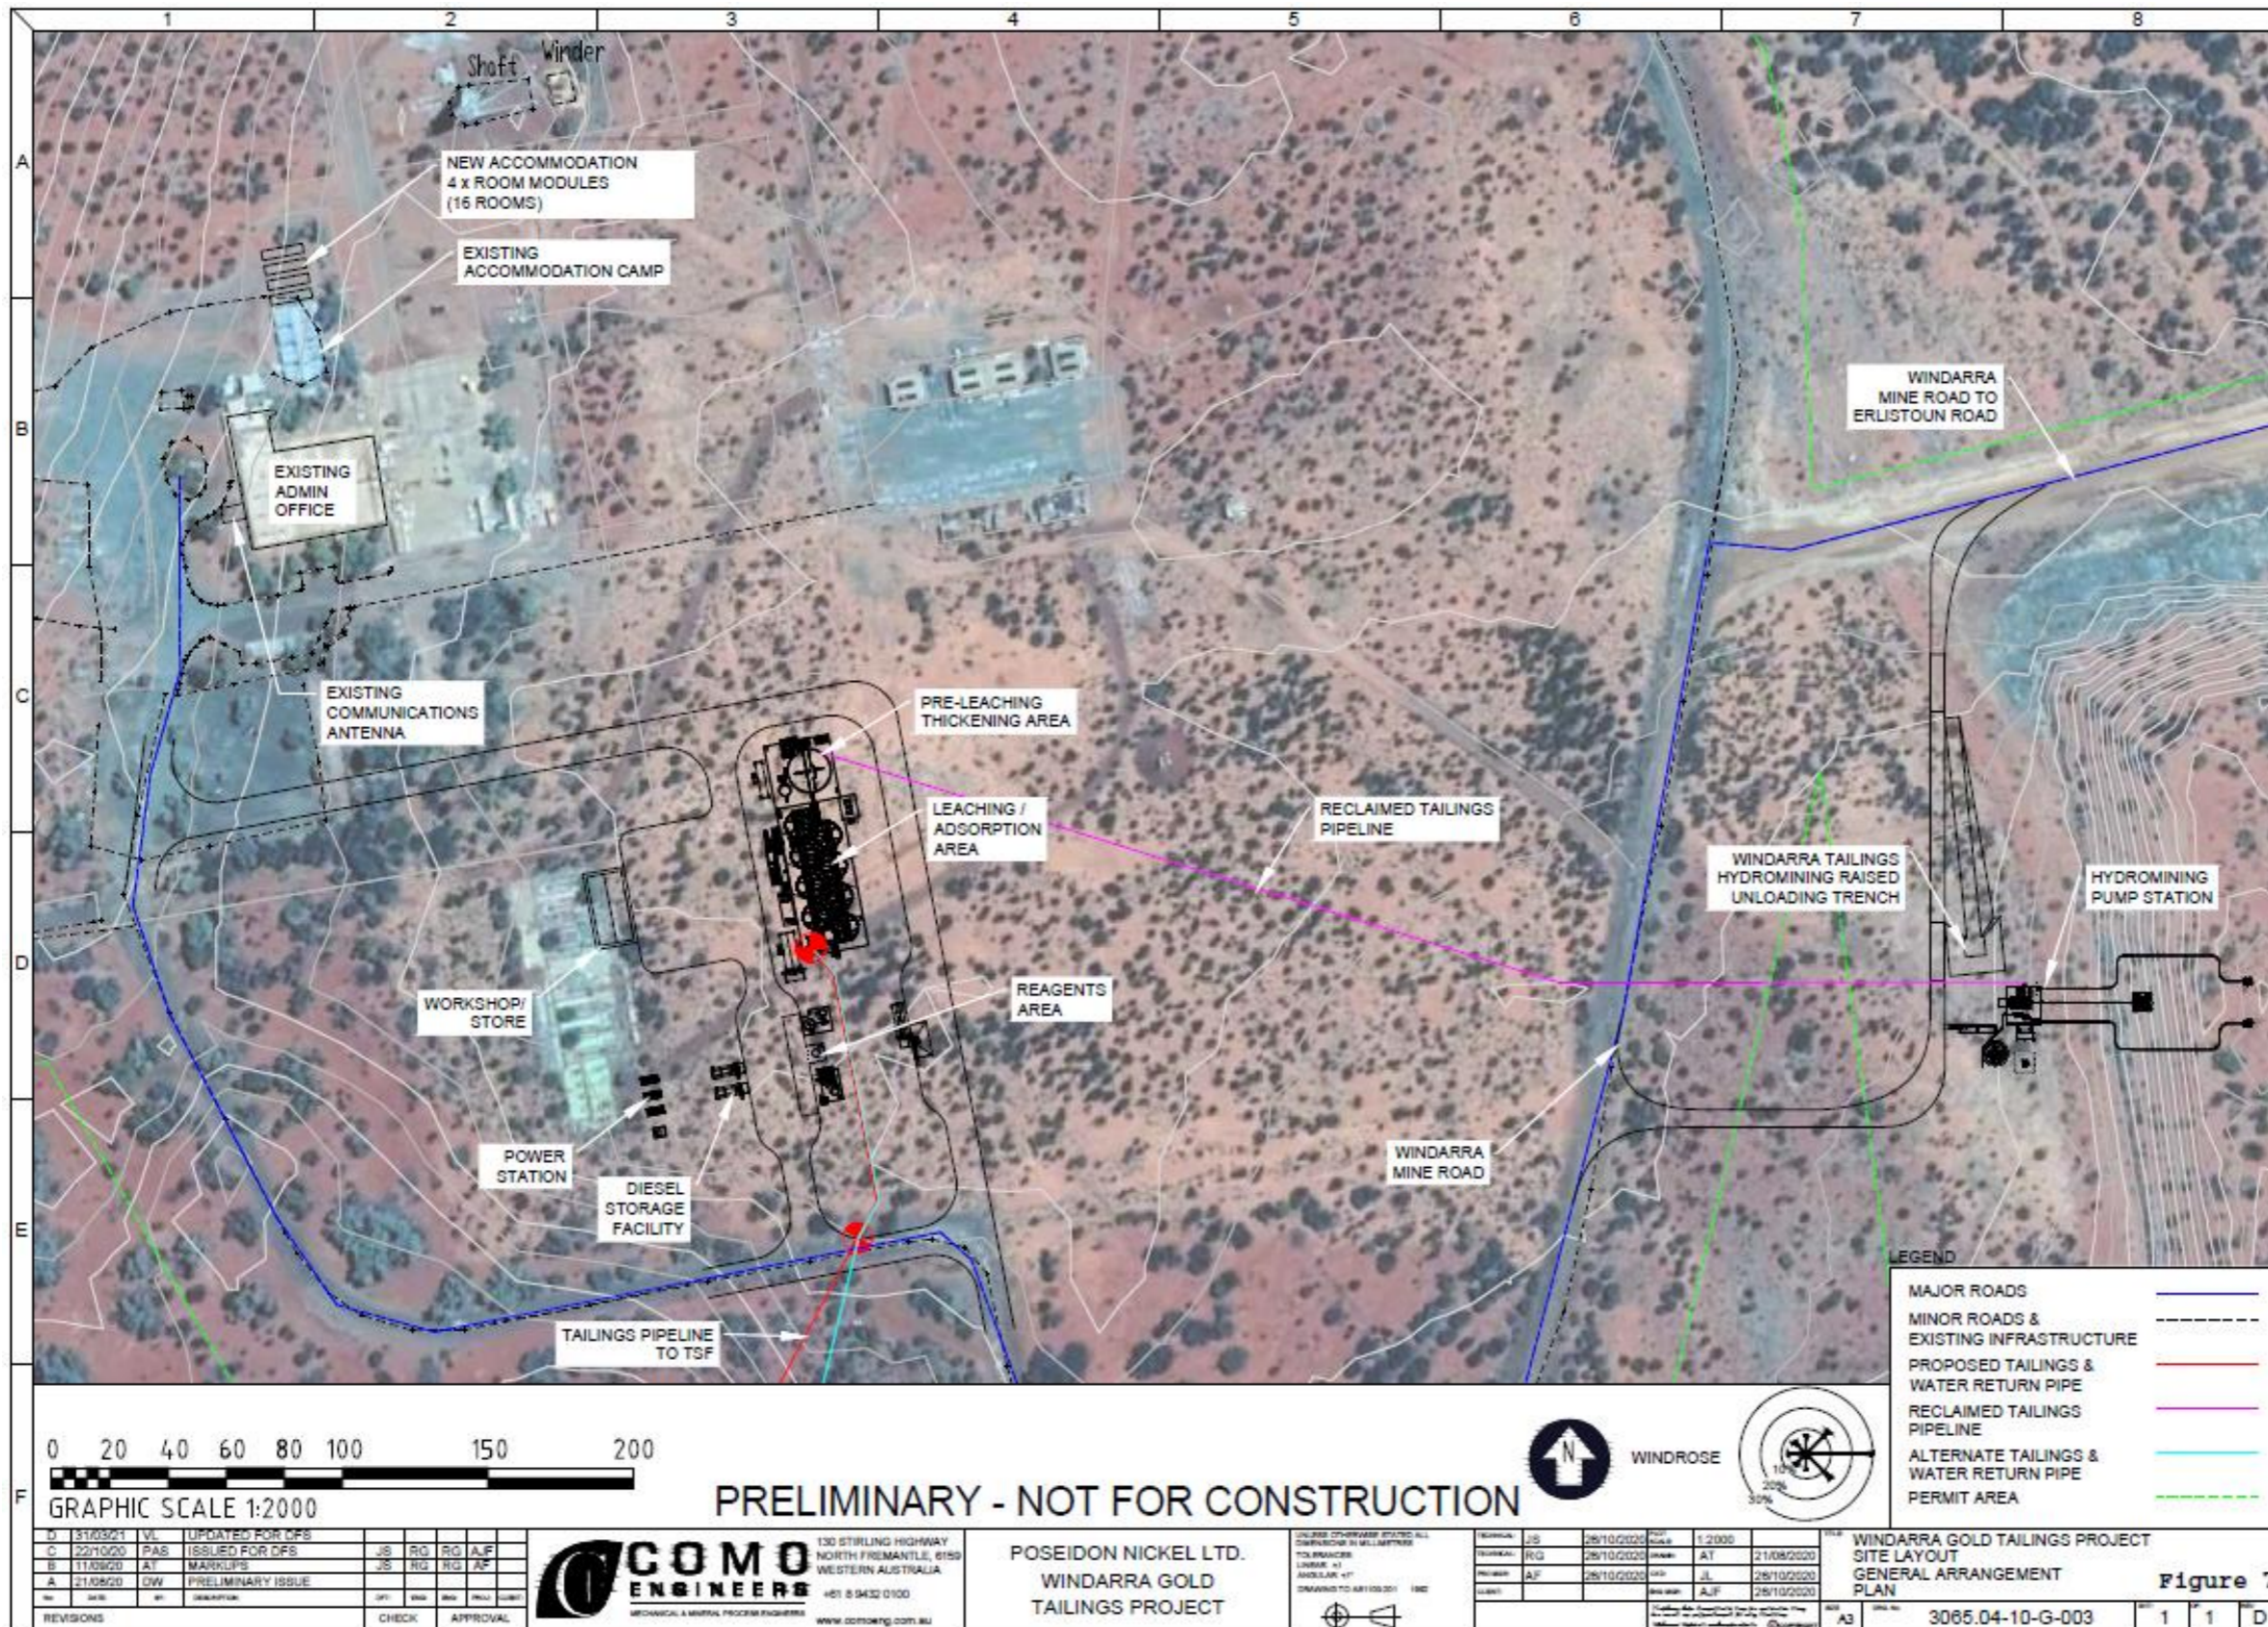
Gold tailings retreatment plant and hydro mining infrastructure layout
